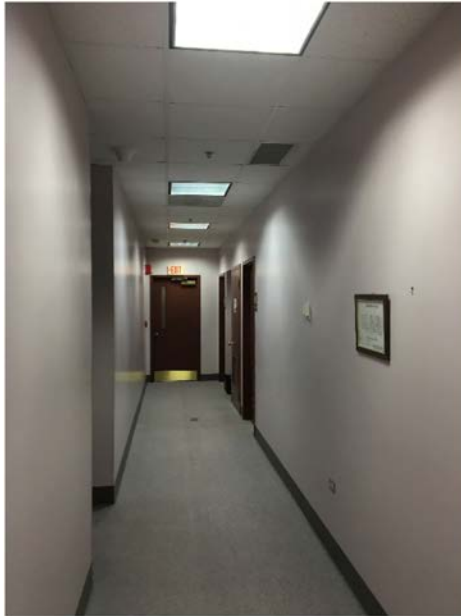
B-922 Legal Area – Before Construction.
